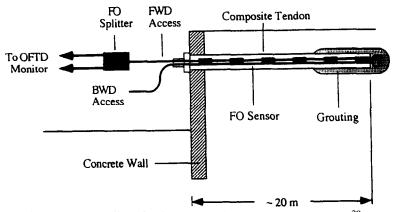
Distributed sensor for concrete wall anchoring system (Zimmerman and Claus<sup>29</sup>).
